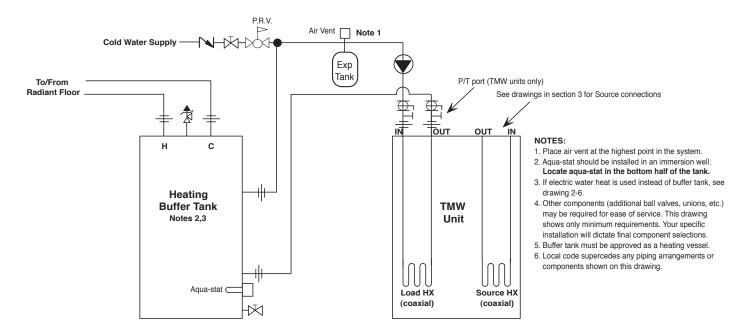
THW Typical Load Piping / No DHW Heating or Separate DHW System / No Cooling or Separate Cooling System: System #2 uses one or more water-to-water units and a buffer tank for each unit. Drawing 2-2 shows a typical piping arrangement for this system. A thermistor mounted in an immersion well senses tank temperature, which allows the internal controls (THW units only) to engage the water-to-water unit compressor, load pump and source pump(s) when the tank temperature drops below the set point, typically 120°F [49°C] or less. The radiant floor (or baseboard, radiator, fan coil, etc.) system therefore is completely isolated from the water-to-water unit. The controls for the hydronic distribution system energize pumps and/ or zone valves to allow heated water in the buffer tank to flow through the heating distribution system. Potable water is heated with a separate system. If desired, cooling is accomplished with a separate system.
